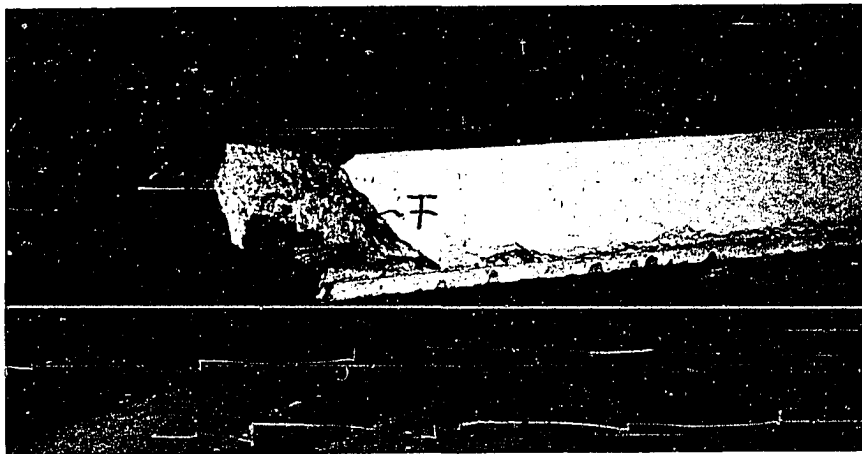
Cross-section of shear-bond failure crack of beam shown in Fig. 13
